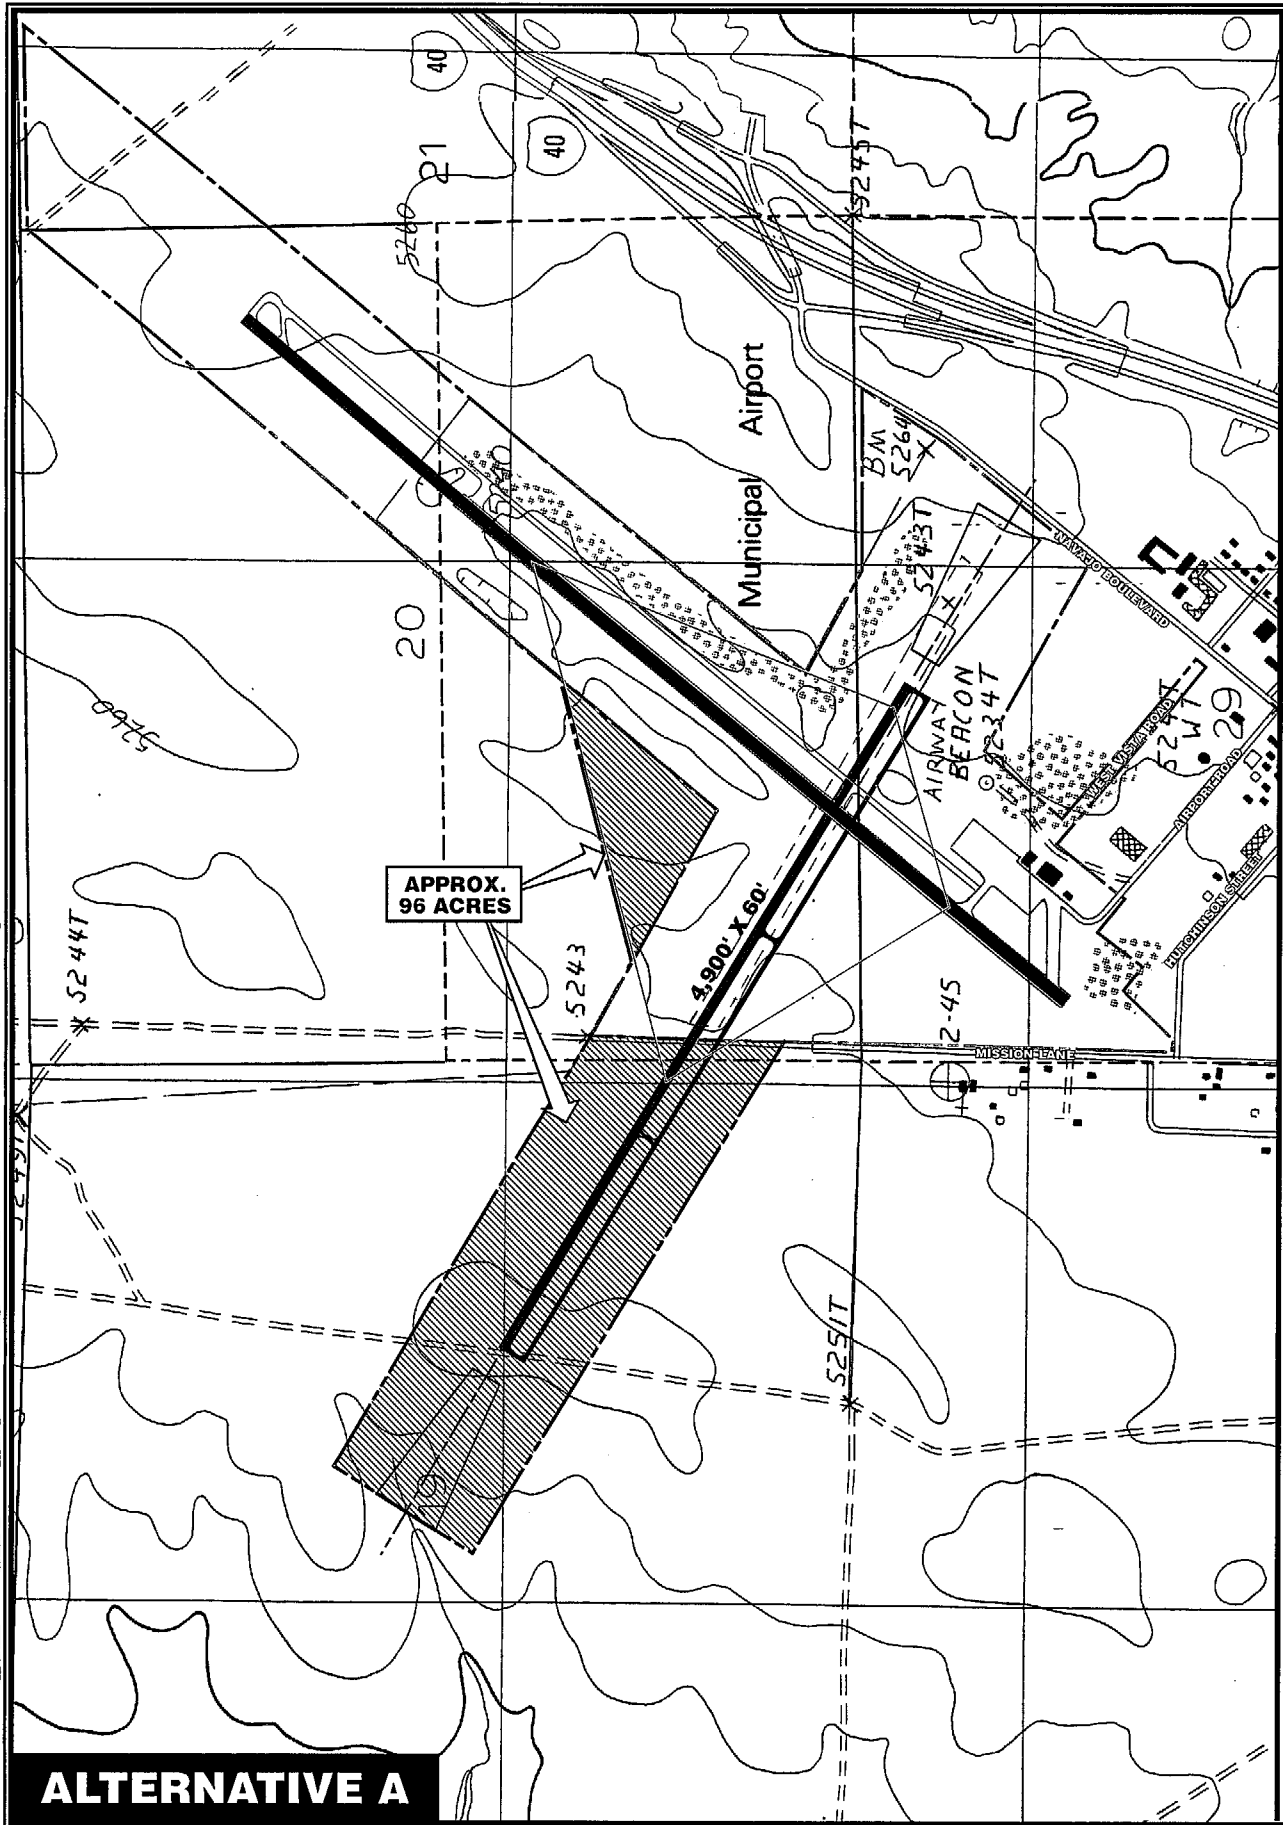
C depicts two alternatives for the development of a paved crosswind runway at Holbrook Municipal Airport. Crosswind Runway Alternative A examines the option of reconstructing Runway 11-29 in its present position. In this alternative, the crosswind runway would be positioned so that the Runway 29 RPZ at the east end would be positioned entirely on existing airport property. This ensures that existing facilities along Navajo Boulevard would not be located within the Runway 29 RPZ and enable the City of Holbrook to have full control over the Runway 29 RPZ to prevent incompatible development in the future. As shown on the exhibit, the acquisition of approximately 96 acres of land is required to protect the RVZ, Runway 11 RPZ, and provide sufficient area for the
